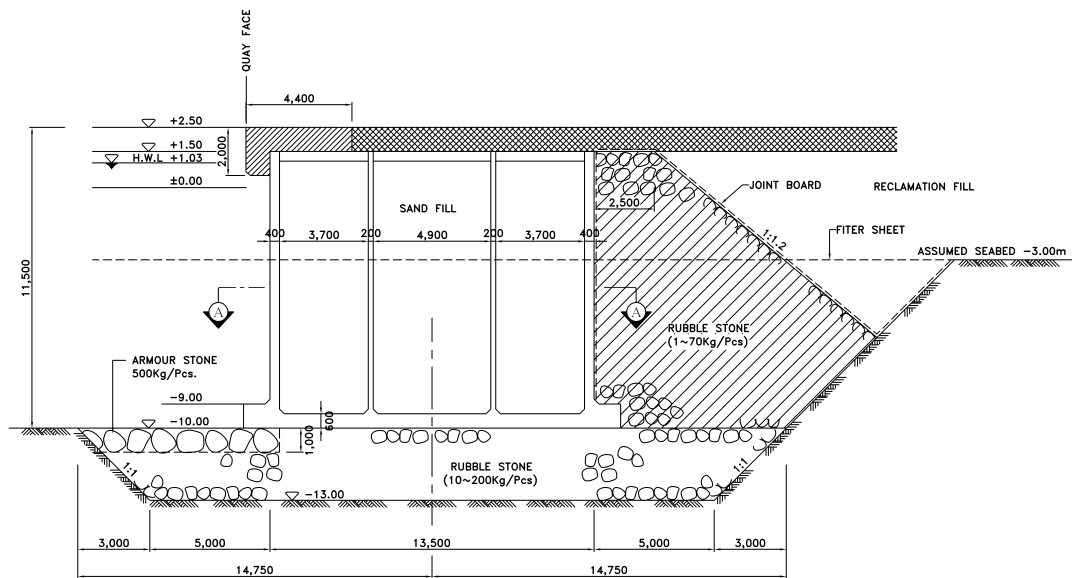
C-2 Bojonegara Quay Wall of Multi Purpose Berth (Concrete Caisson, -10 m)
